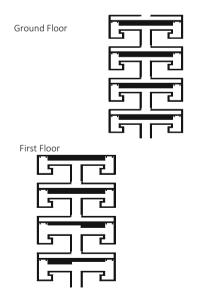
Floor plan of the ground and the first floor of the virtual hotel with the six "T-type" corridor intersections.
